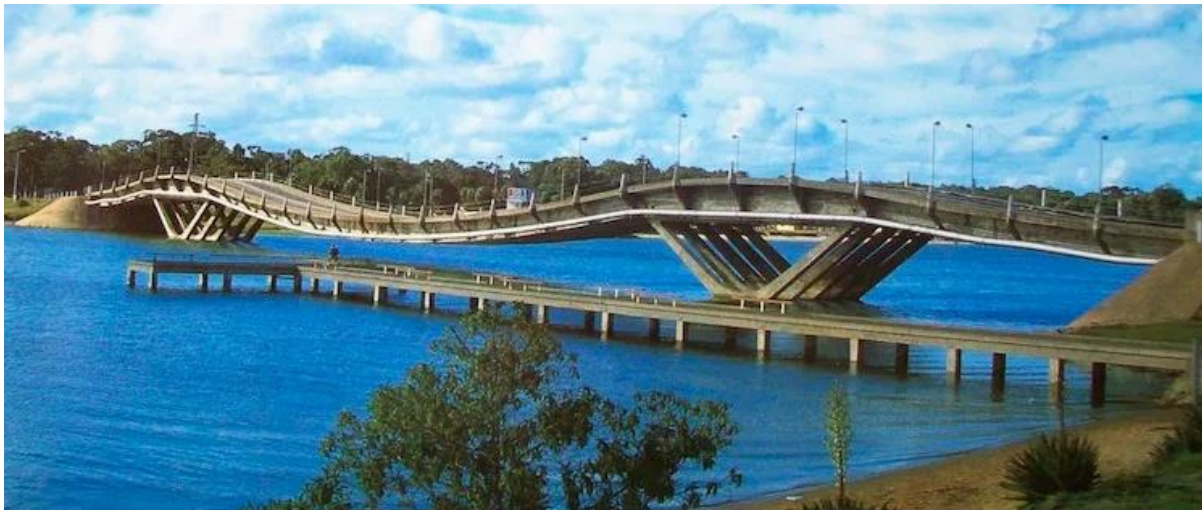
Leonel Viera Bridge | The First Stressed-Ribbon Bridge Constructed in Uruguay in 1965
